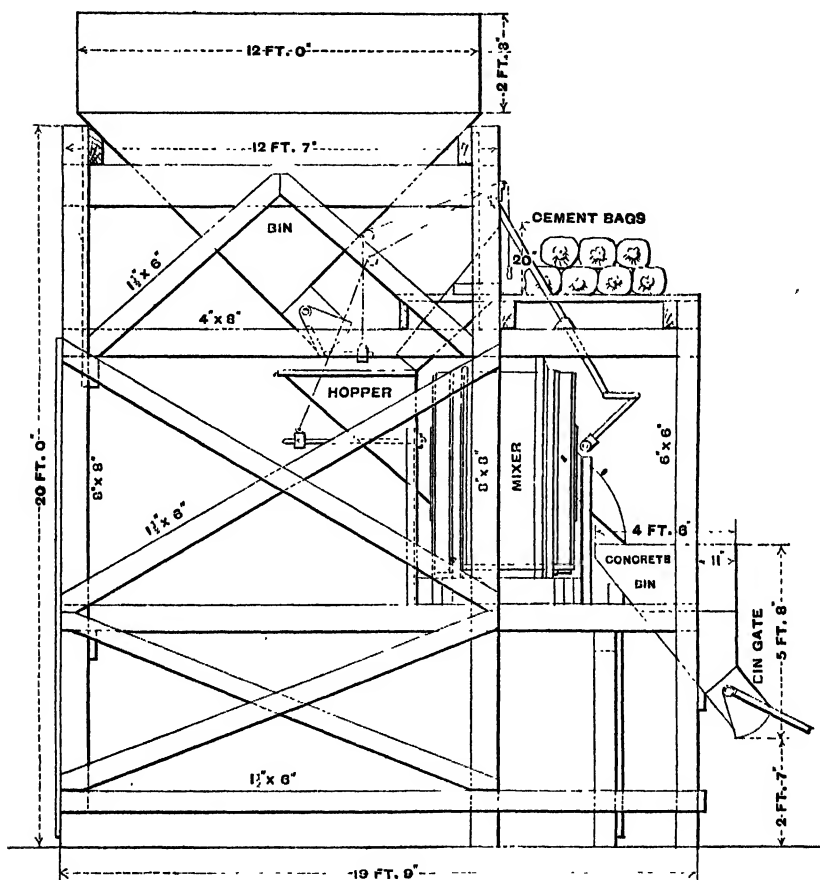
Stationary Mixing Plant with a one-yard Rotary Batch Mixer.
